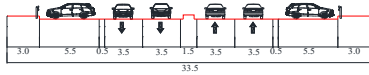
Typical cross section of City center Road (Secondary: Rural Area)
